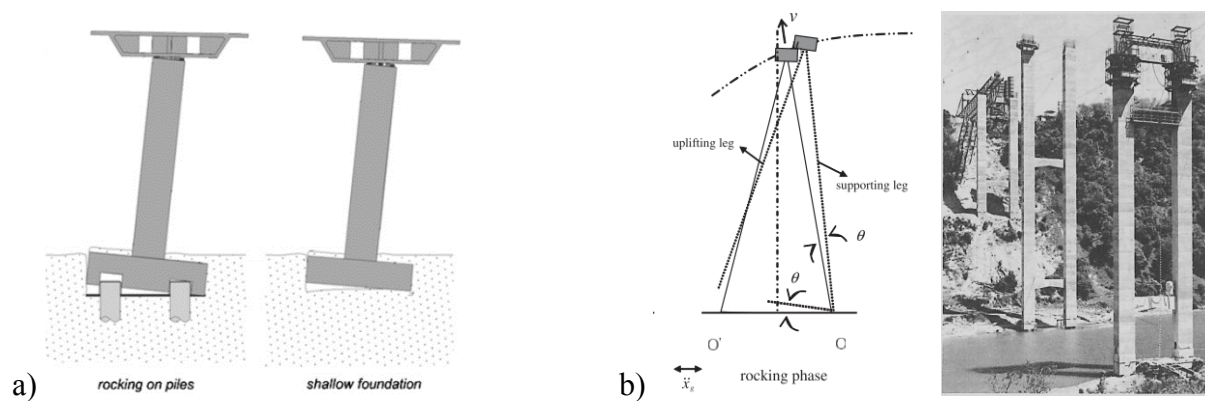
a) Examples of foundation rocking structures [9]. Left, rocking on piles and right, rocking shallow foundation. b) Examples of stepping structures. Left, displaced structure showing mode of movement [11]. Right, Rangitikei viaduct NZ a bridge using stepping piers [16].
